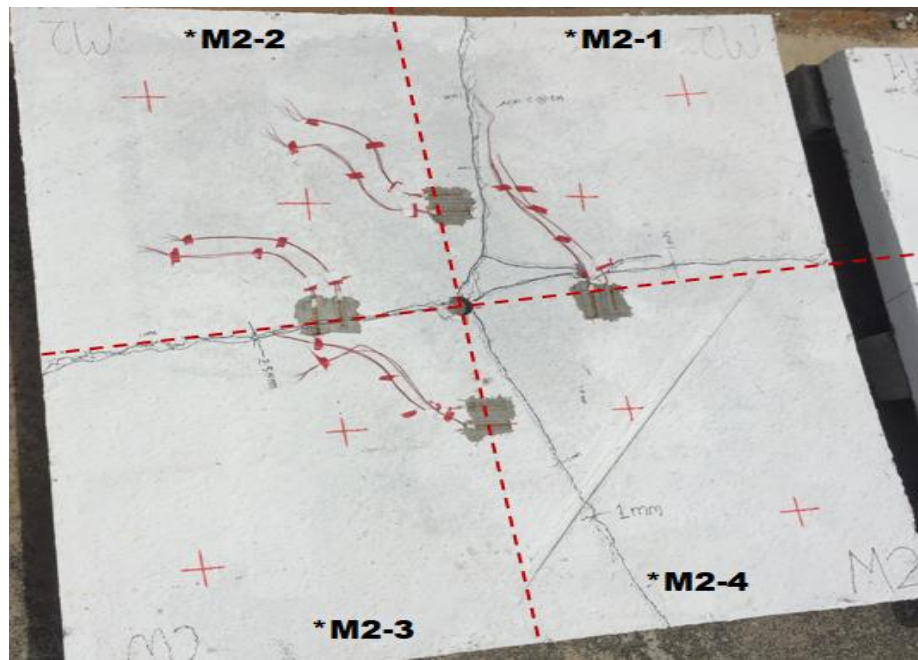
Failure for Slab Specimen M2 (2m drop) – another plan view
